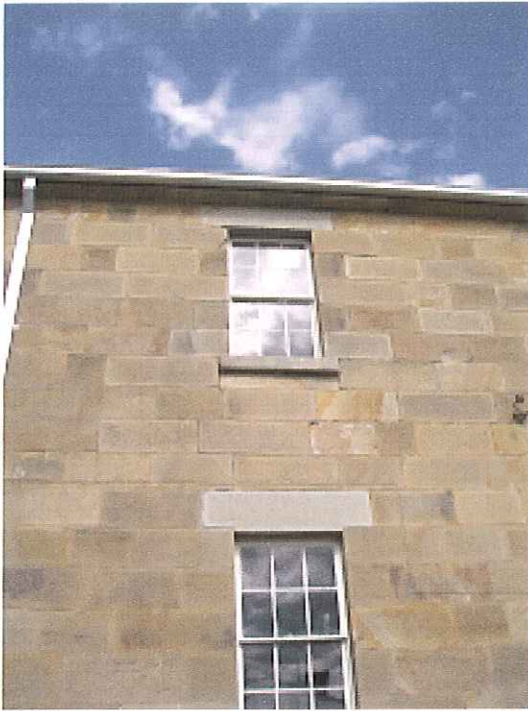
Note lack of headers and vertical stone cracking between windows indicating ashlar movement and delamination
